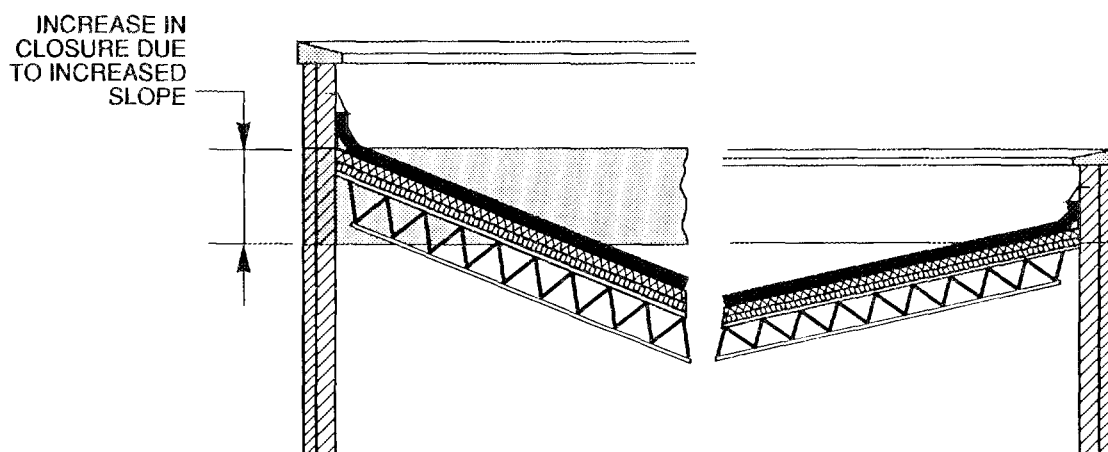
The amount of building closure (walls, parapets, and gables) can be significantly impacted by changing the roof slope. The cost of this closure can be large and must be taken into account when evaluating roof options.
